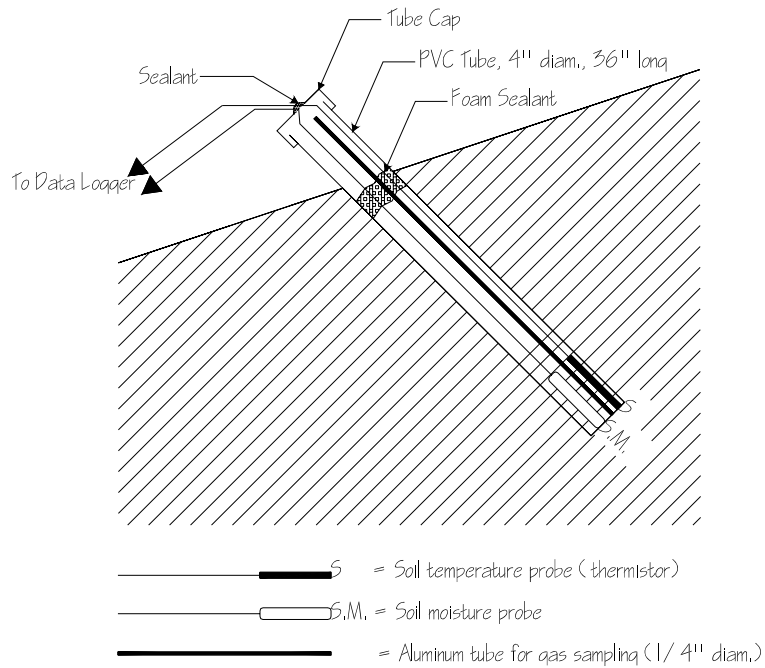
Typical Cross-section of Instrumentation in Soil-only section (not to scale)
